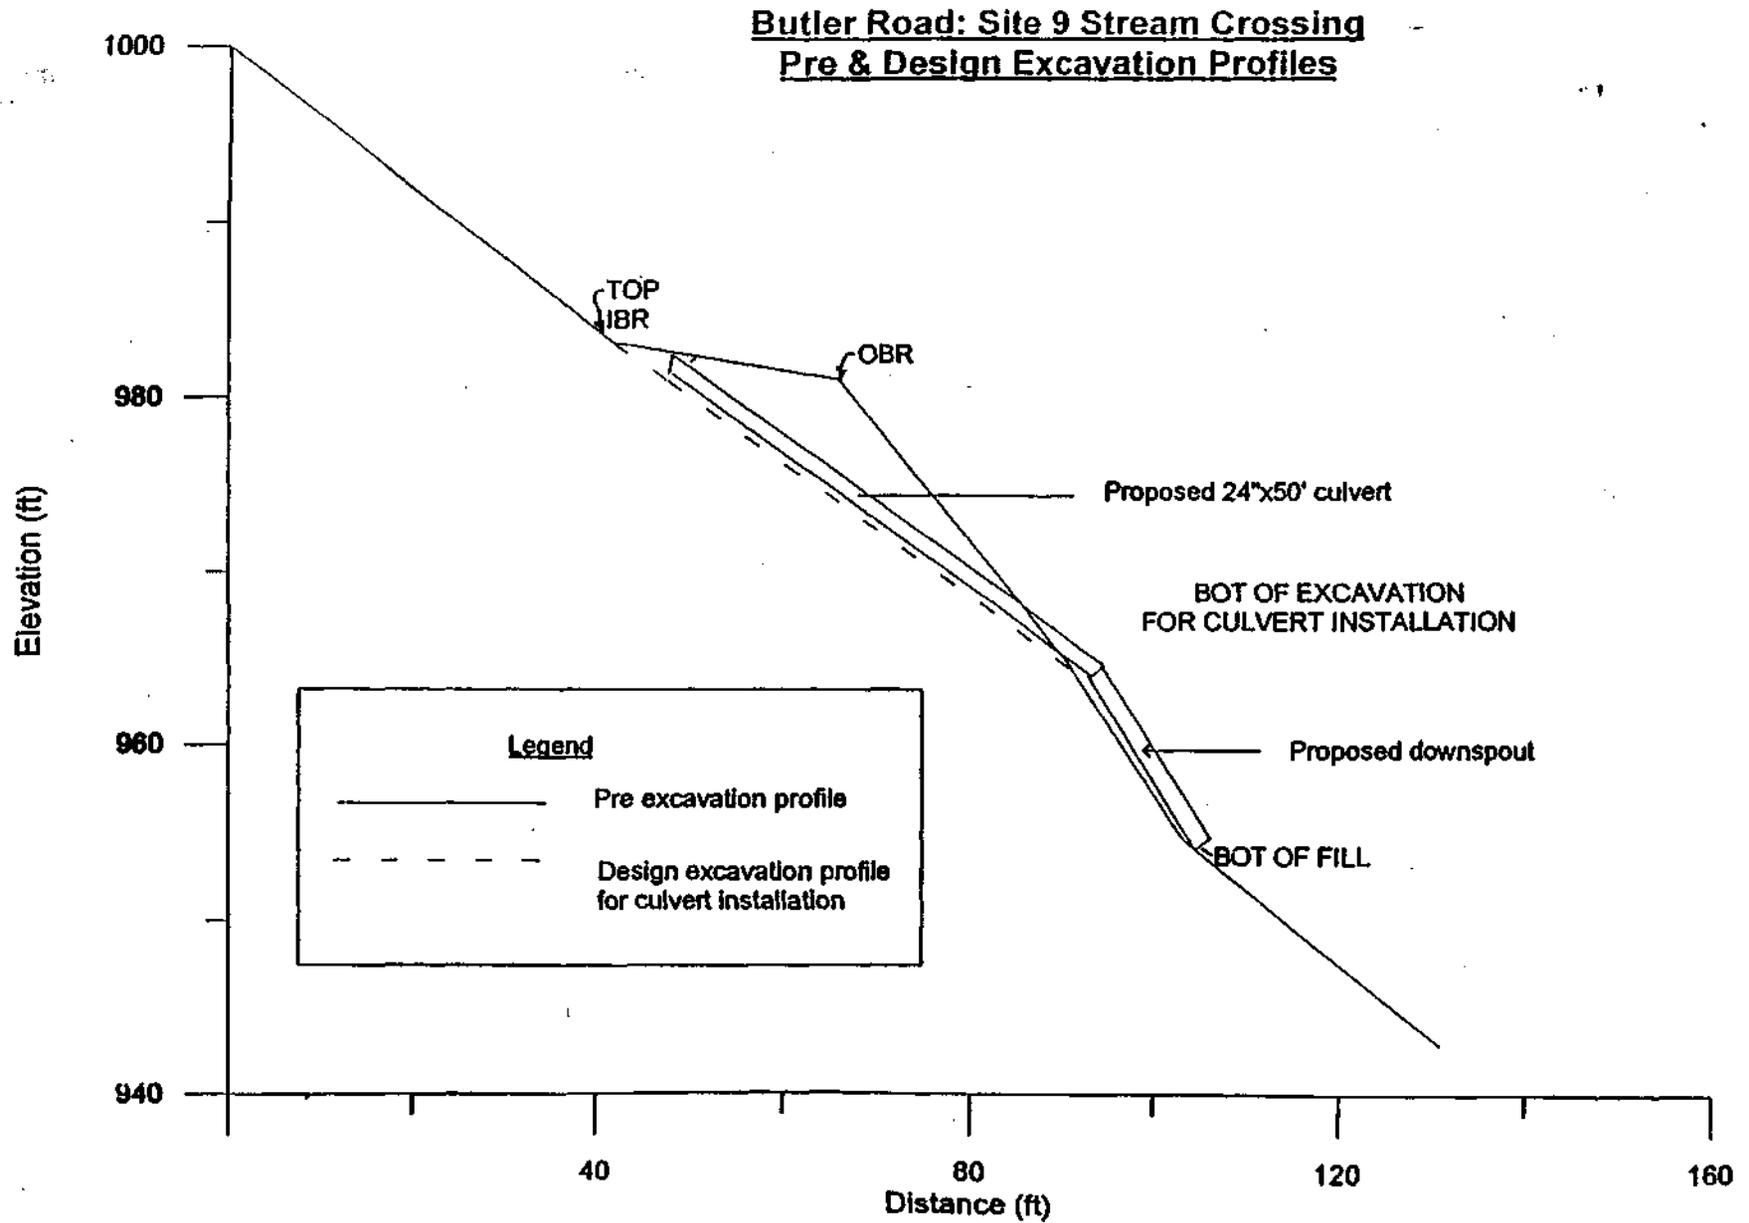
Butler Road: Site 9 Stream Crossing Pre & Design Excavation Profiles.
